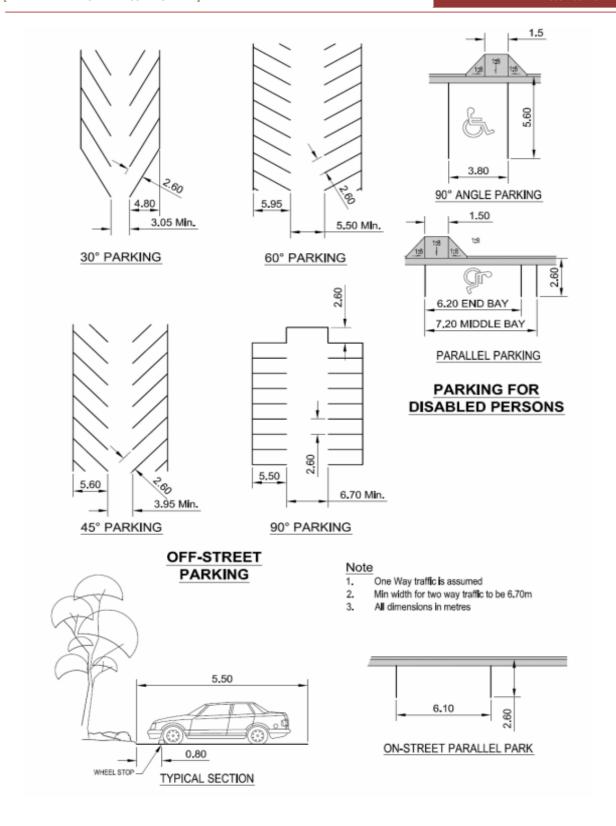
Parking Spaces & Aisles – Recommended Dimensions
